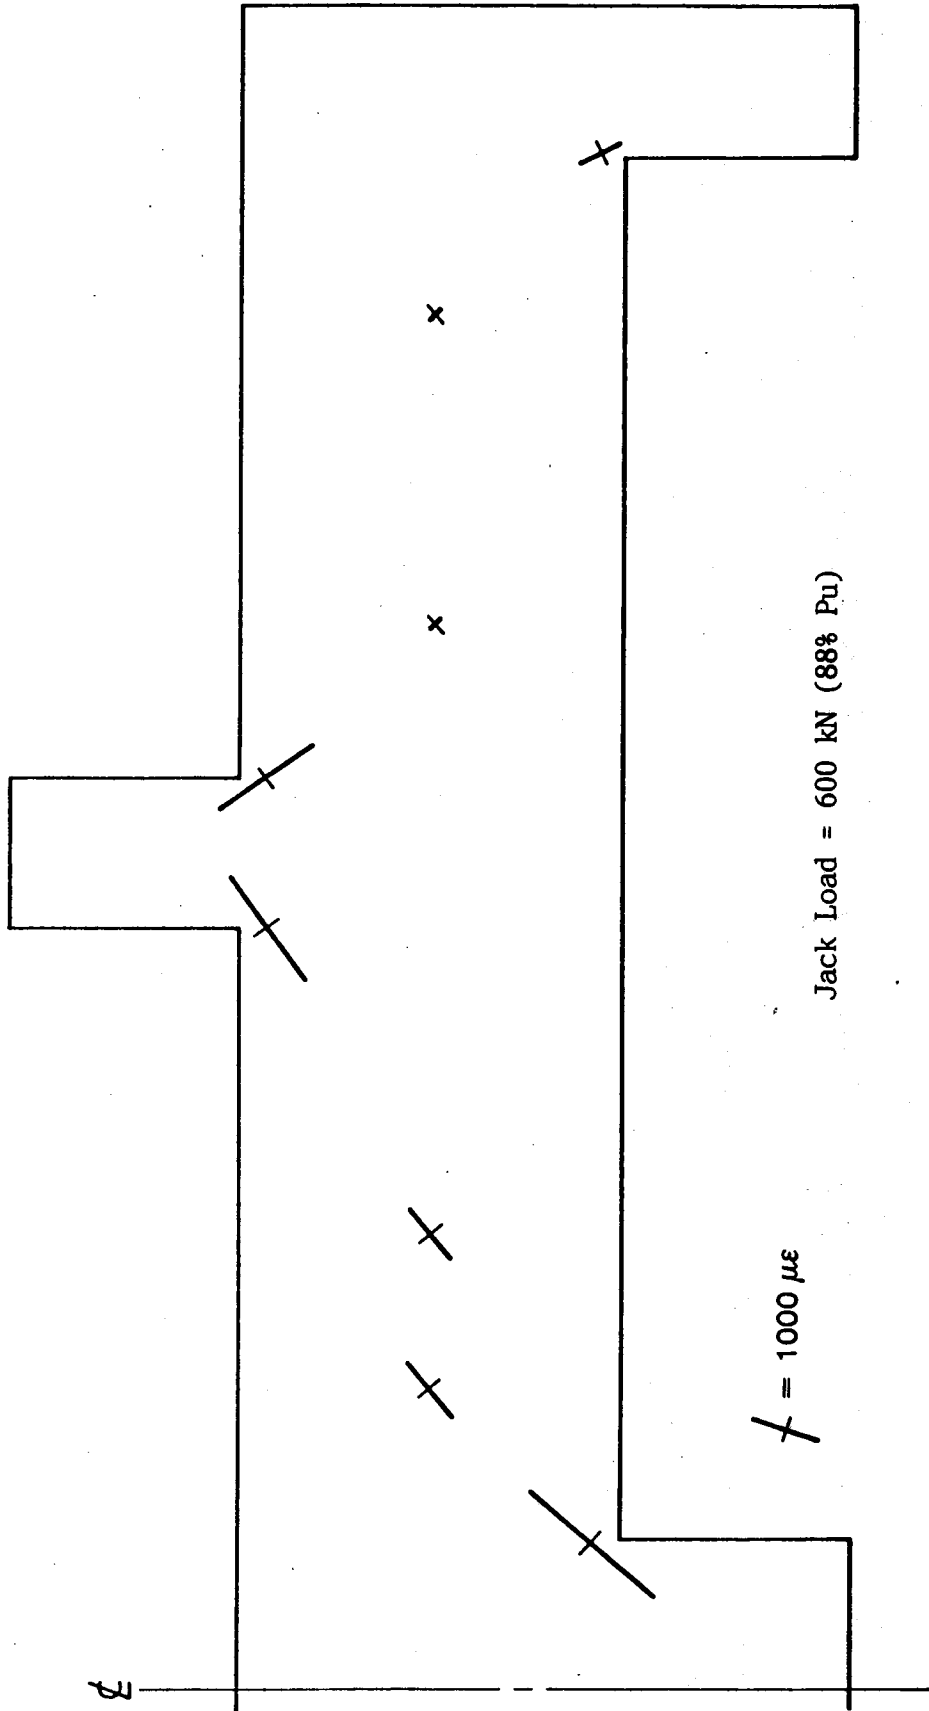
Beam 5/2.0 Concrete Compressive Strains
